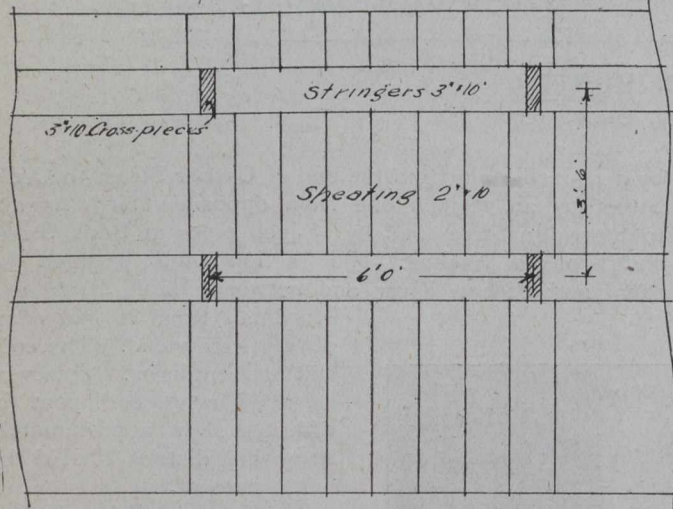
Longitudinal Section Showing Method of Shoring Trench.
